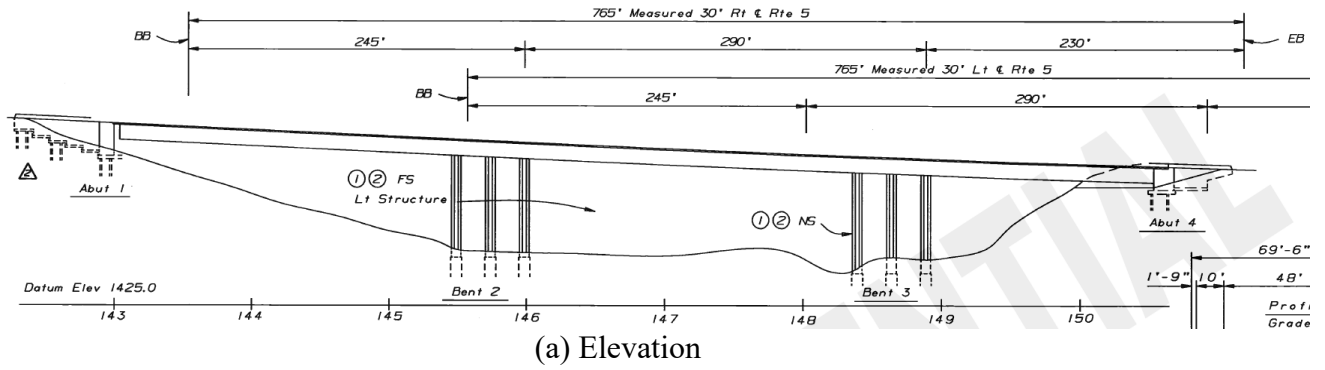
General plan of the prototype bridge (#53-2790L)
